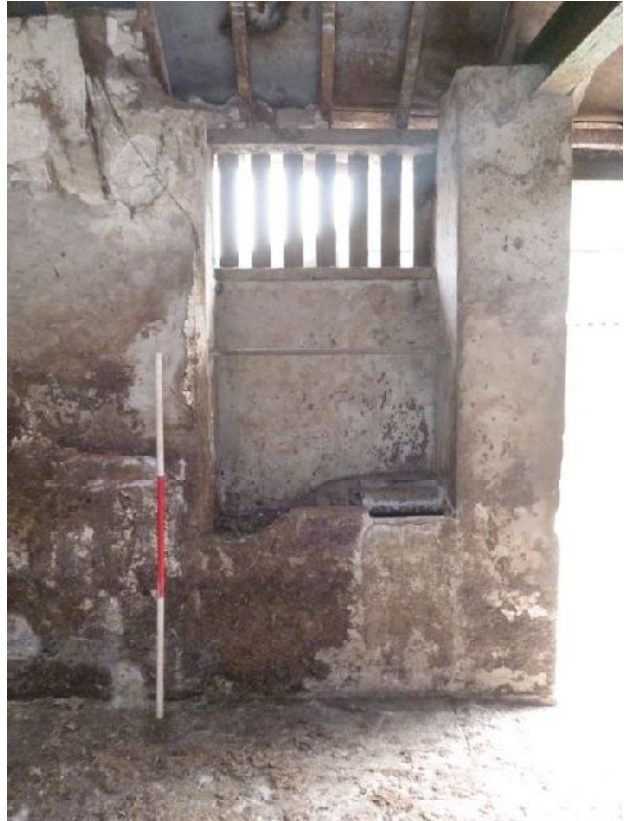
(right): Window and trough, south-east elevation, Room 1, Building 2
